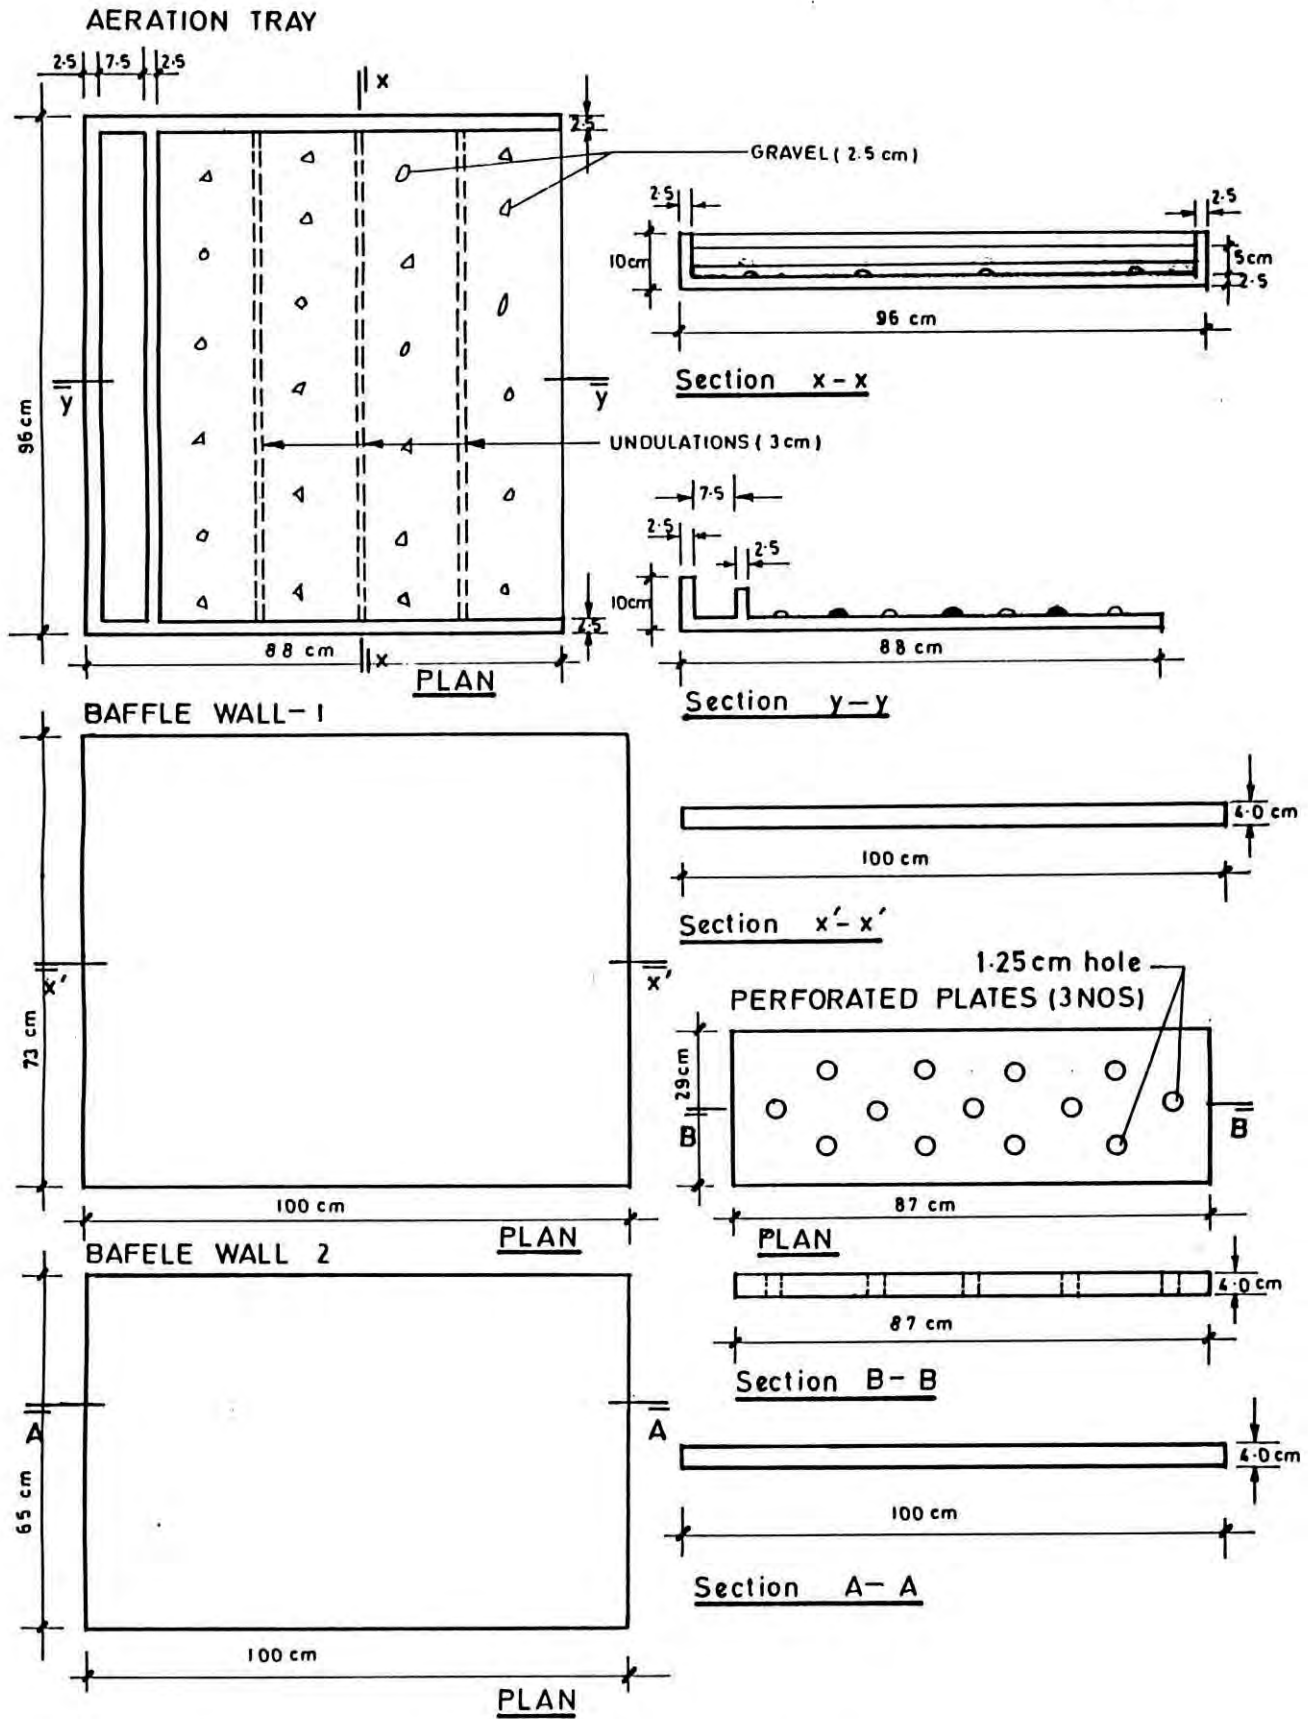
PRECAST MEMBERS OF THE PLANT
